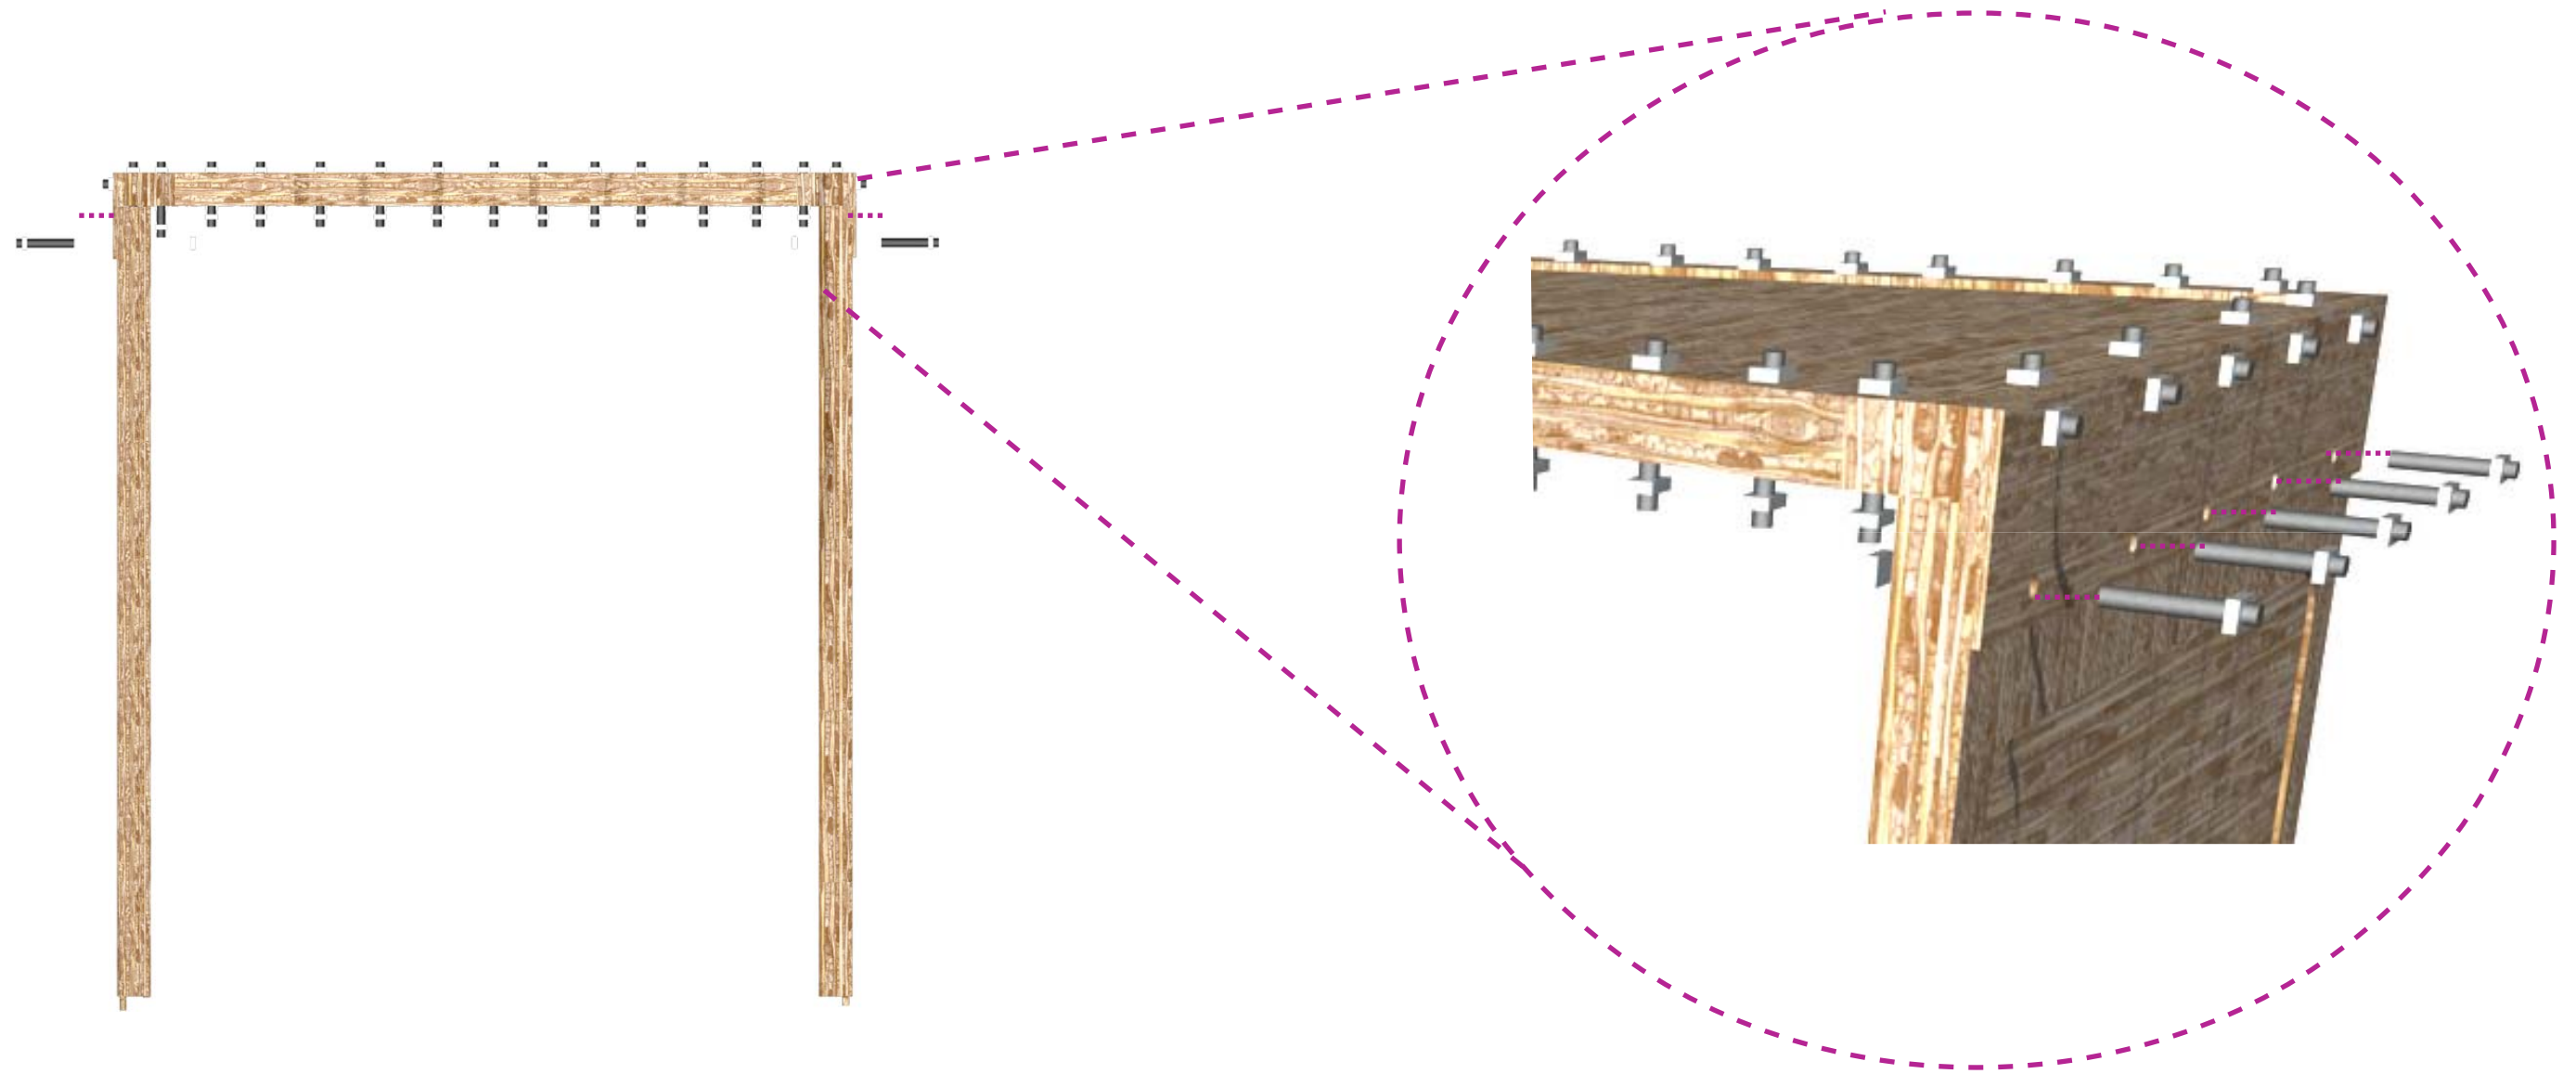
Module connection details.. (Sosa Fontaine, 2010).
